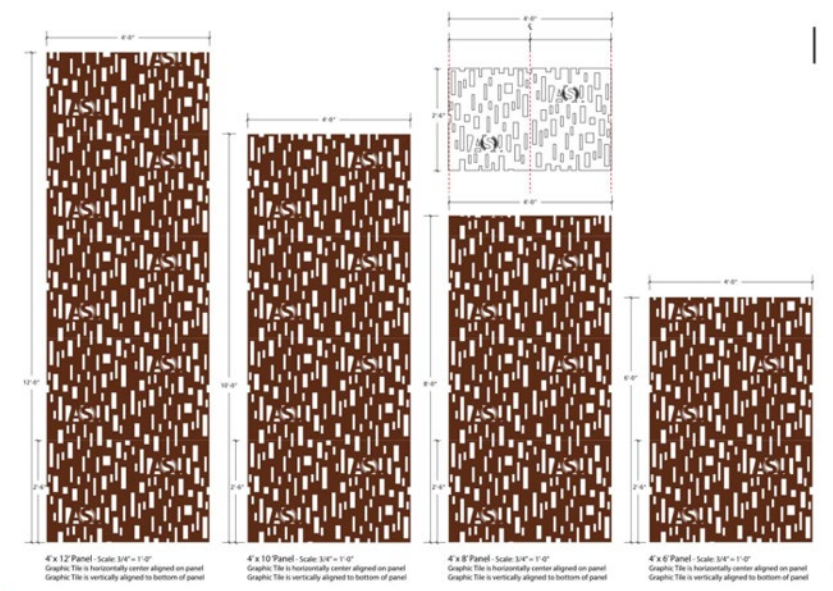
Typical ASU Enclosure Fencing with CMU Wall
